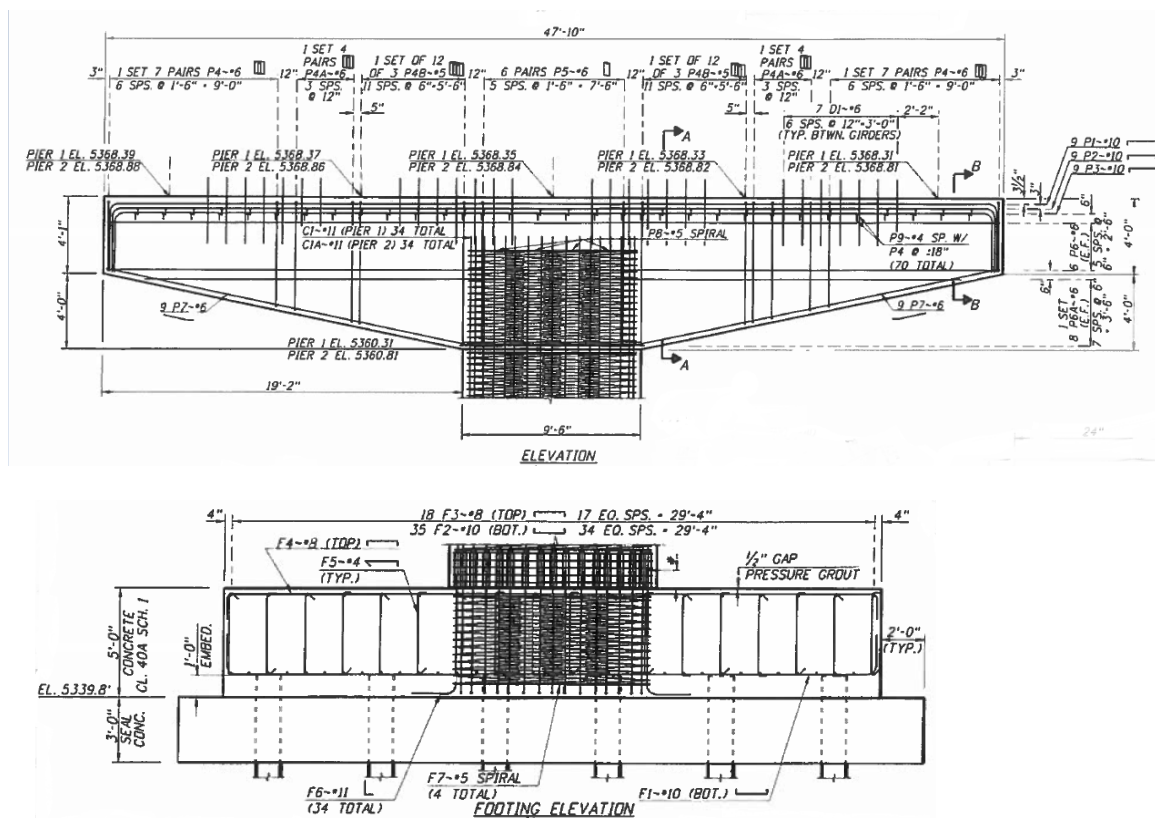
Column Cap, Column, and Footing Elevation Views
